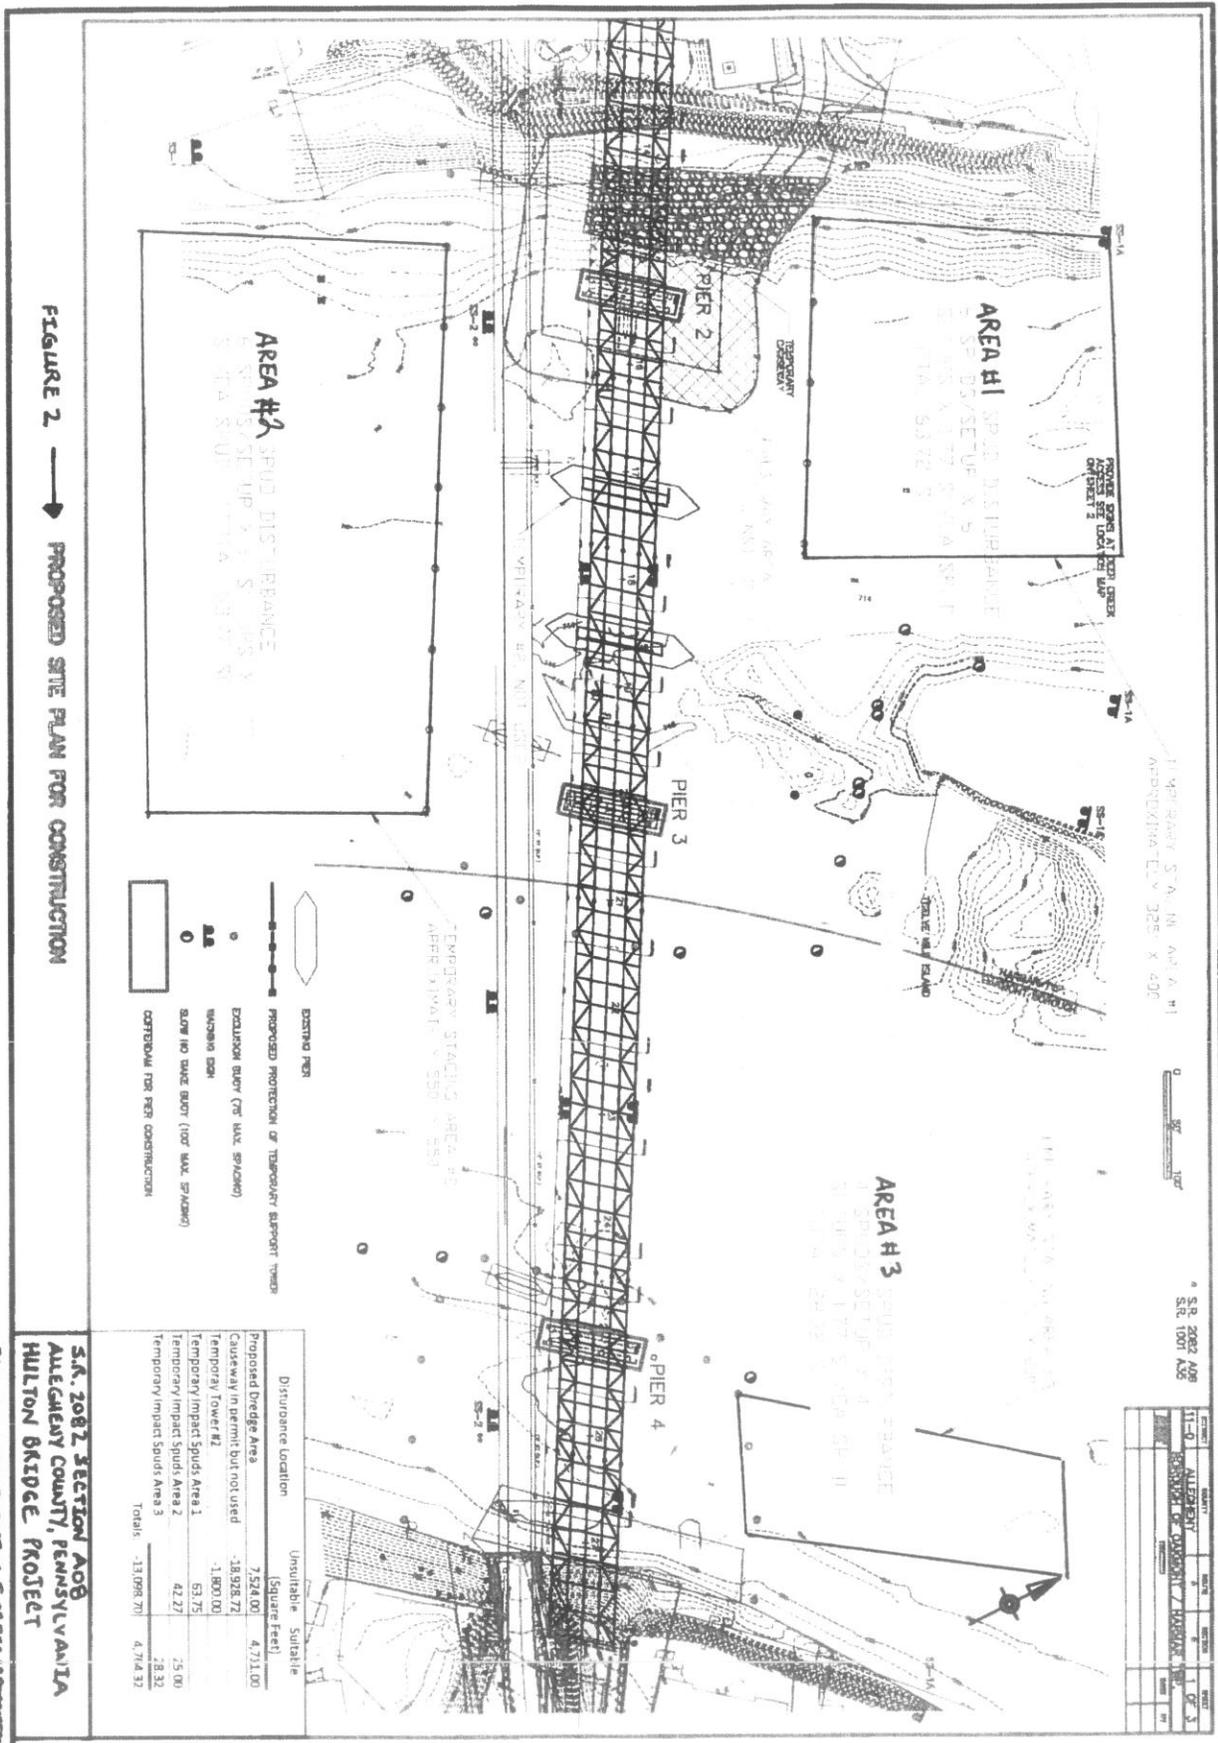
PROPOSED SITE PLAN FOR CONSTRUCTION
